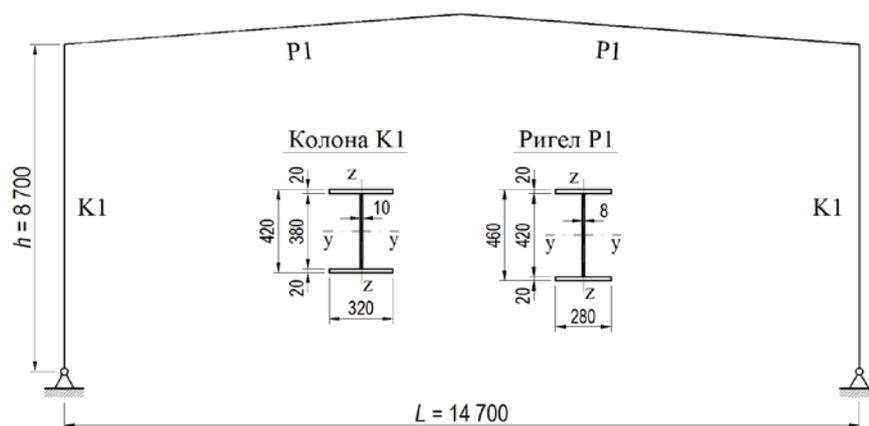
Geometry and static scheme of typical steel frame, part of building in the town of Belovo.
